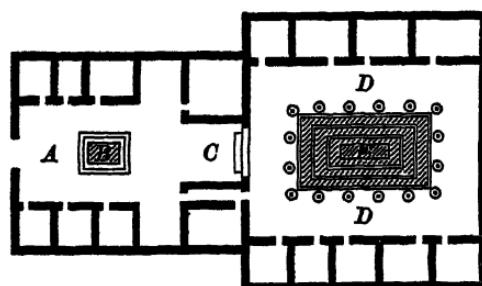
PLAN OF A ROMAN HOUSE WITH PERISTYLE
